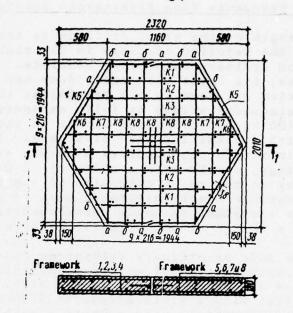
Road hexagonal slab with with a rigid reinforcing framework.
